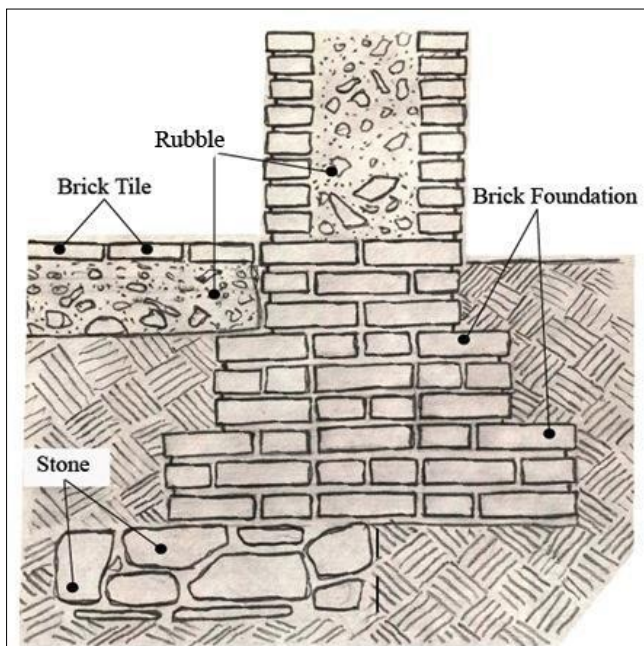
Details of a traditional house's foundation in Erbil Citadel (not to scale) (Abdulkareem, 2012)
